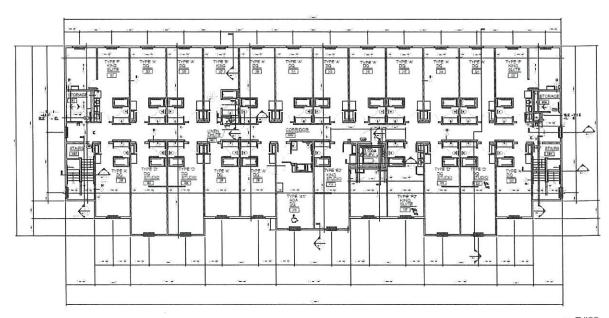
SITE PLANS AND RENDERINGS OF MINIMUM IMPROVEMENTS
